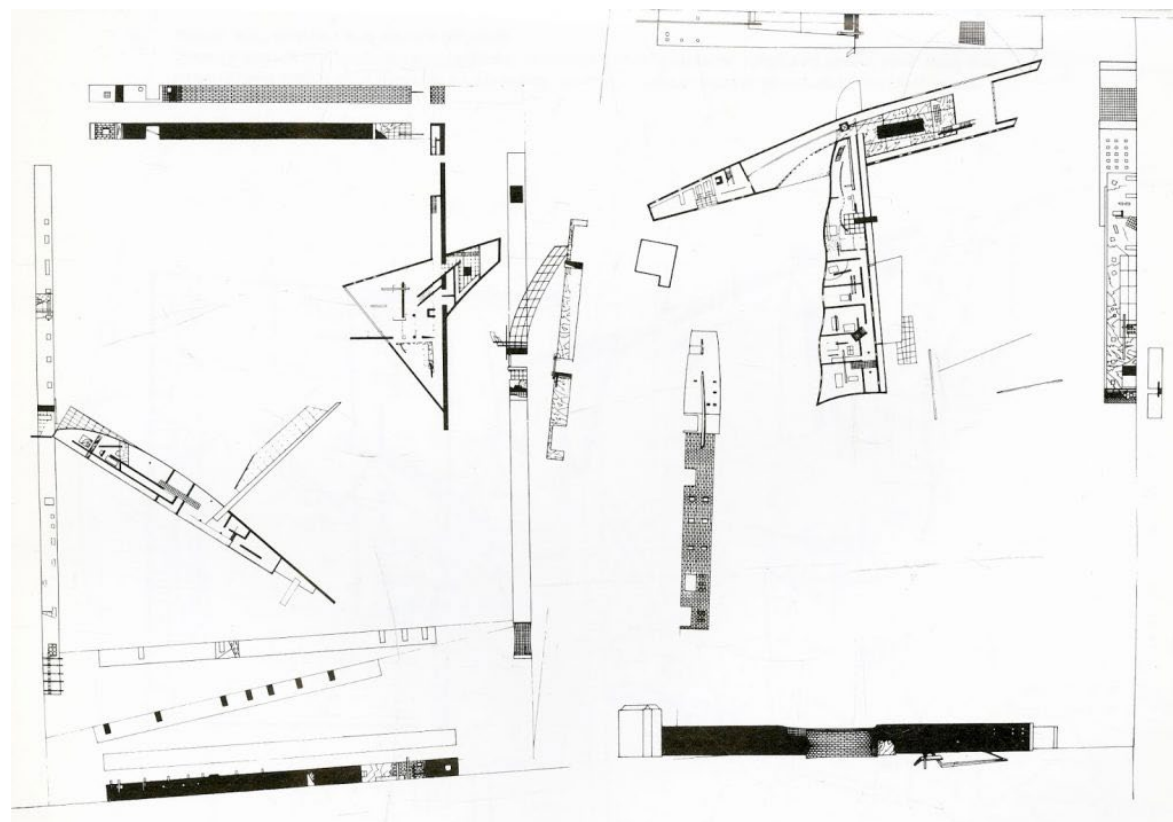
First floor plan and elevations Source: Hidden Architecture. (2016). Residence for the Irish Prime Minister.
